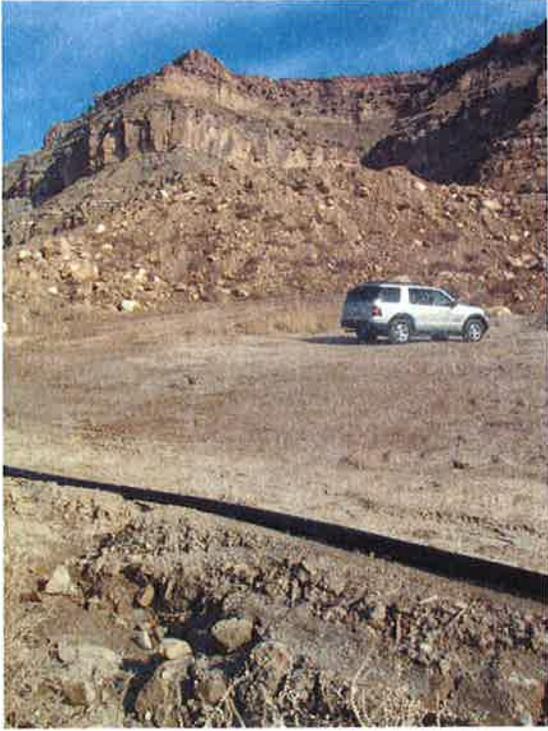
Southwest corner of topsoil pile. Operator has not constructed a berm/silt fence to prevent erosion of topsoil. Runoff from pile is visible along left side of photo.
